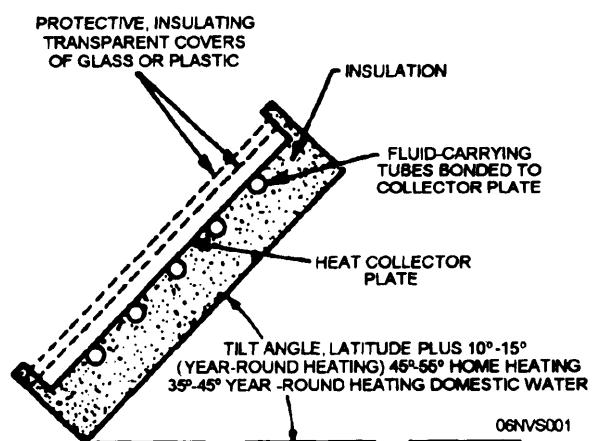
Cross section of a typical solar heat collector with heavy back insulation and two cover sheets.
